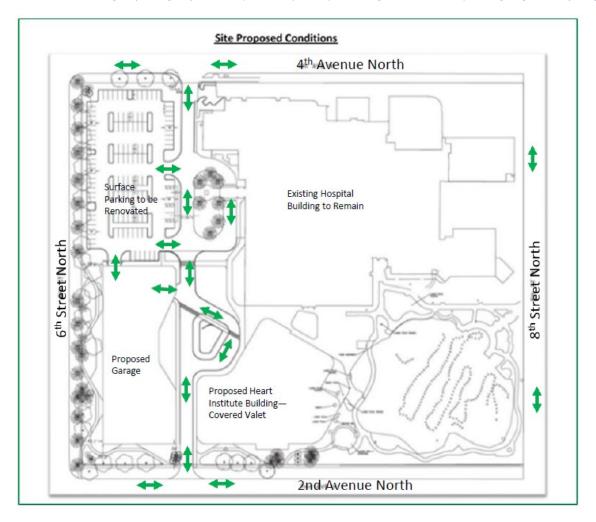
Site Plan of Traffic Flow externally and internally to the site of the proposed garage and proposed Heart Institute Building.
